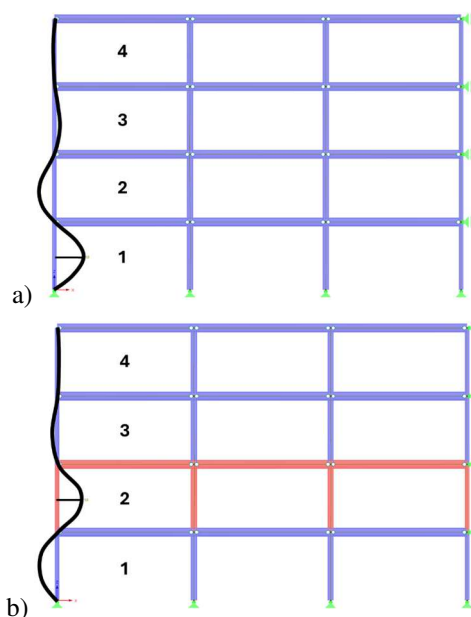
Buckling shapes of the outer column, a) buckling shape of column at a normal temperature of 20 °C, b) buckling shape of column no. 2 stressed by fire (the 2nd floor is a fire section).
